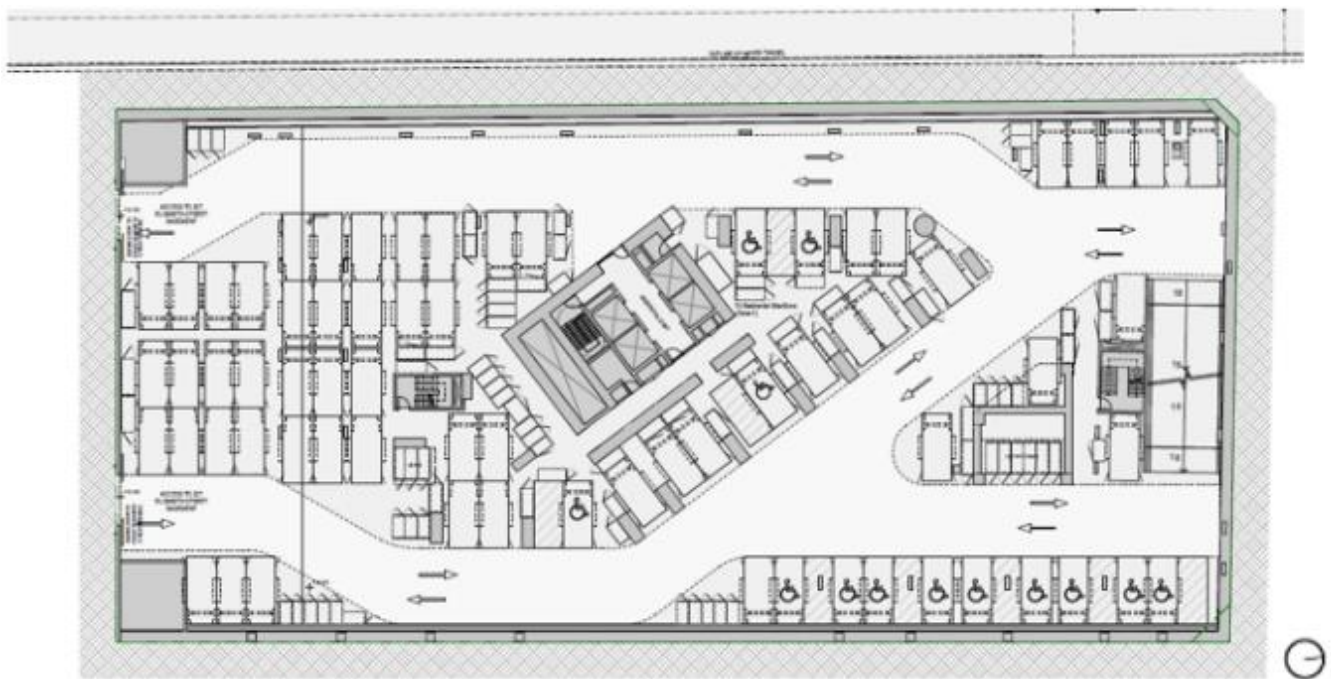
| Proposed basement level 3 (Source: Ethos Urban RtS amended architectural drawings)
